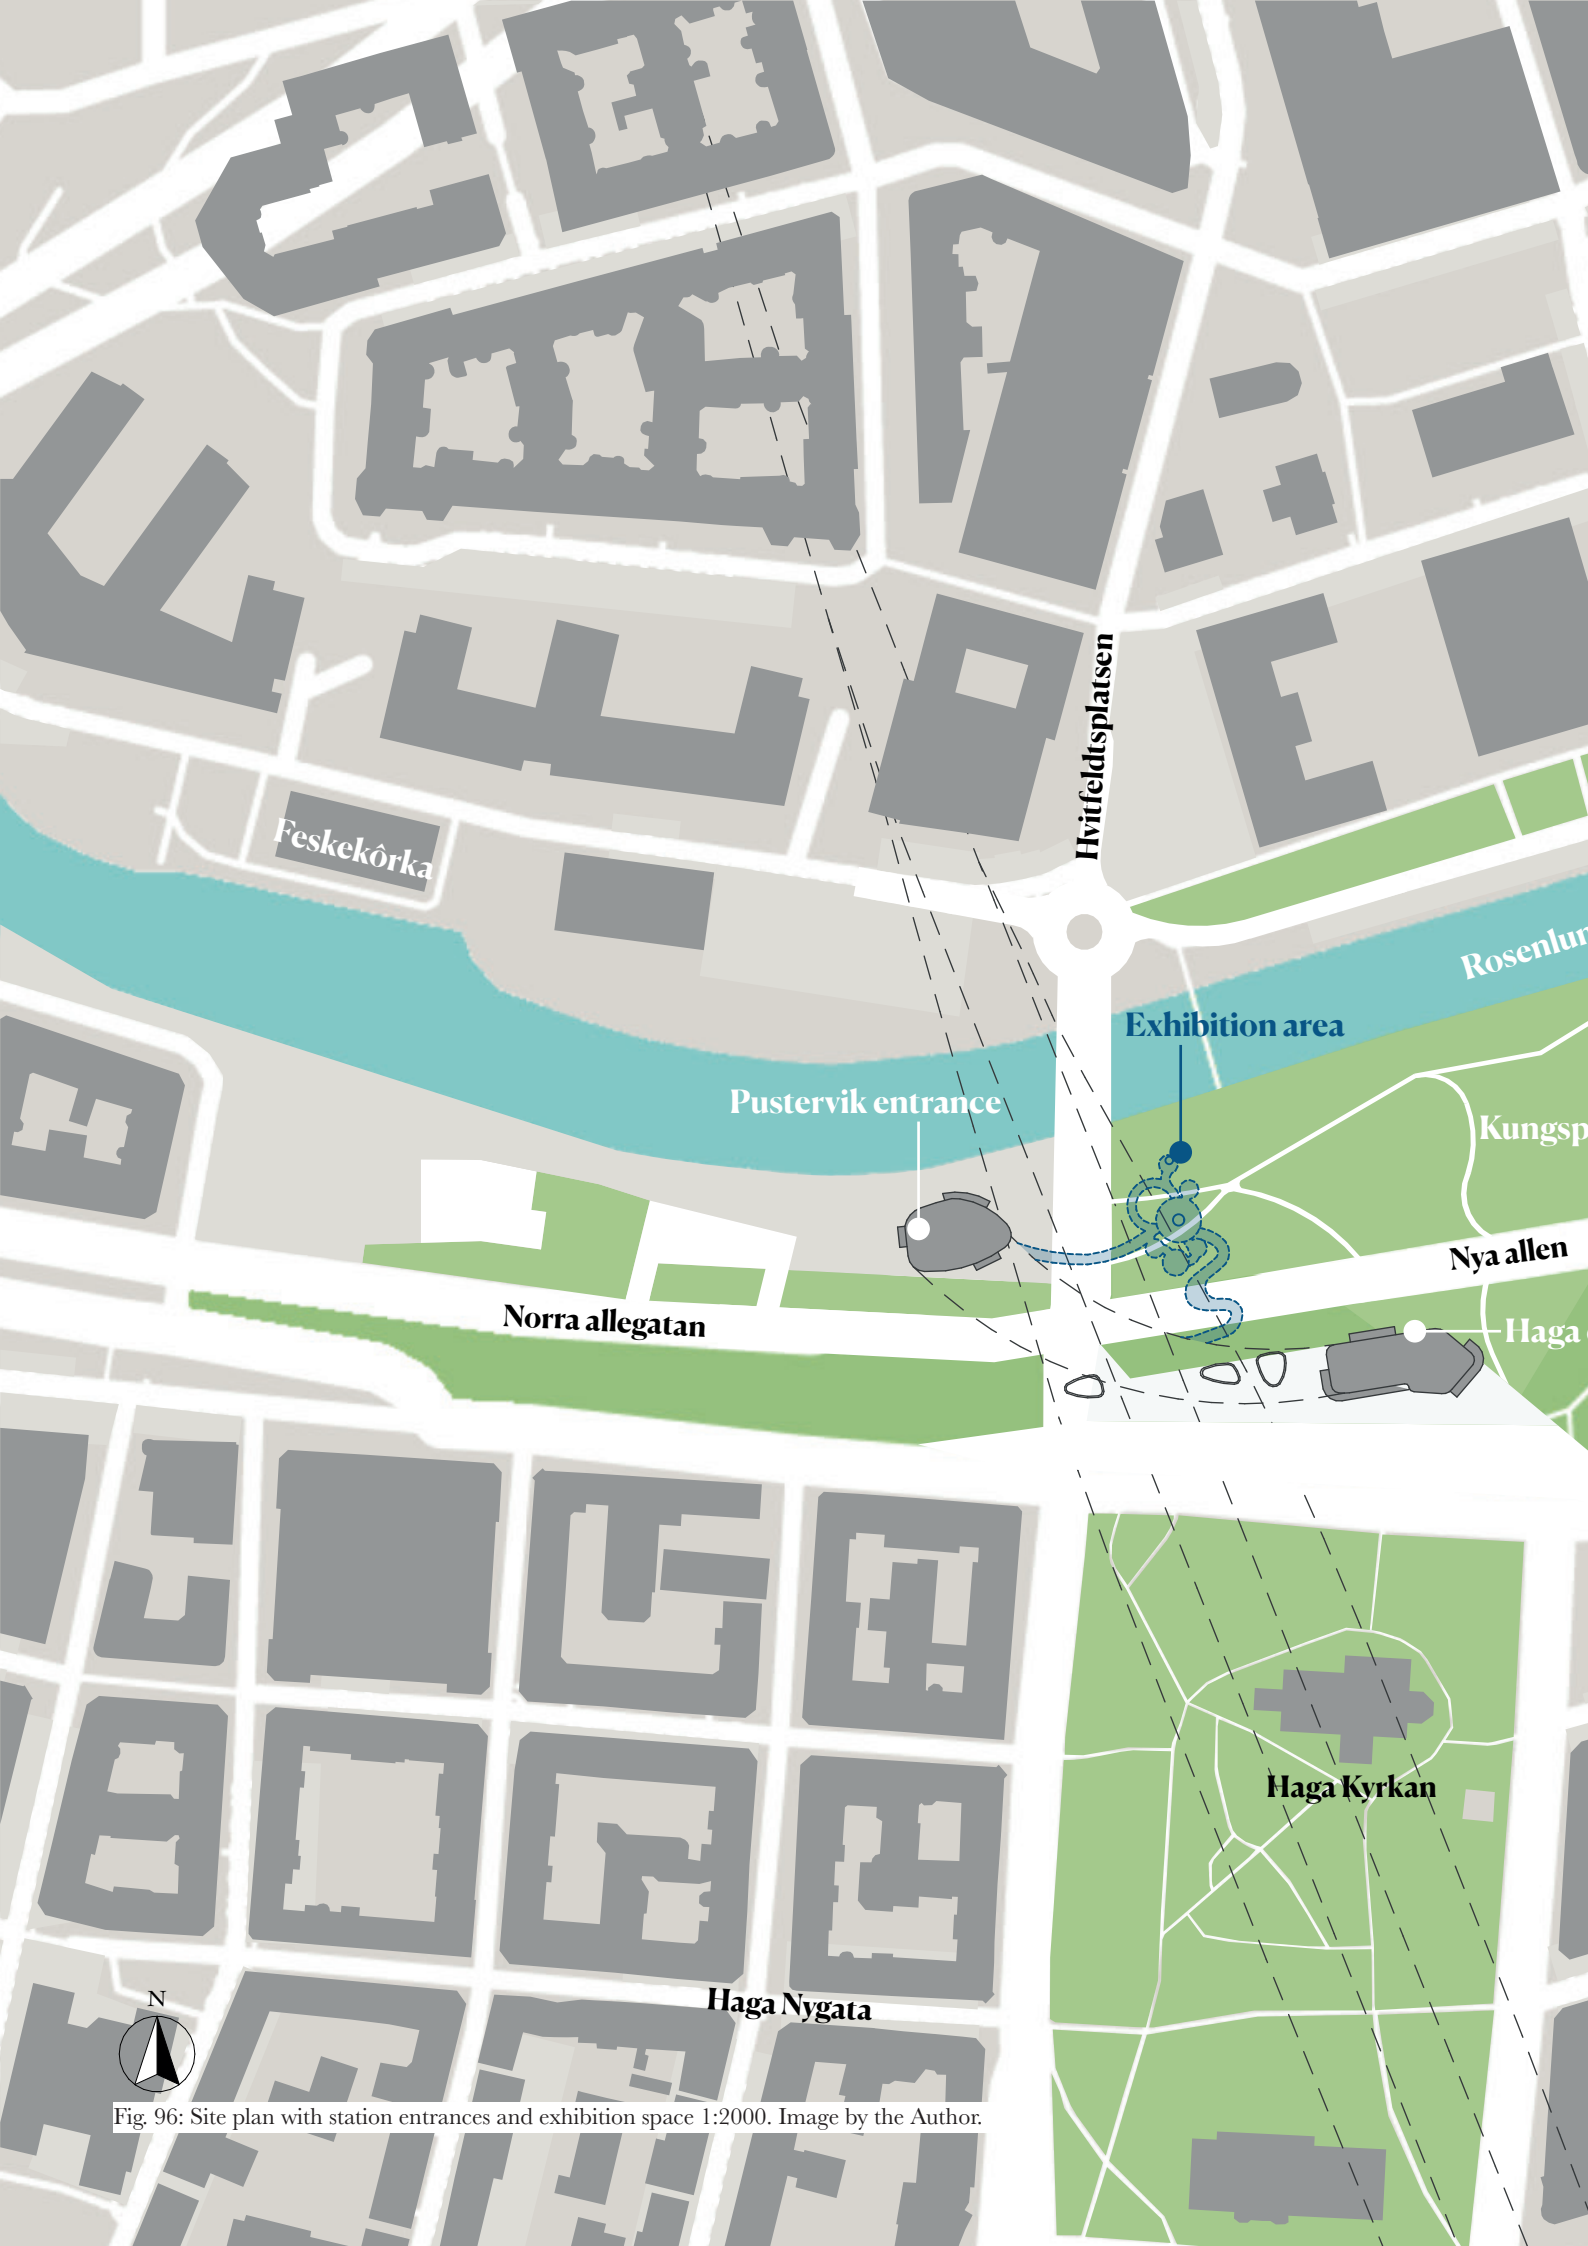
Site plan with station entrances and exhibition space 1:2000. Image by the Author.
